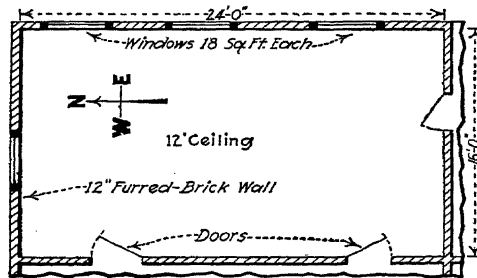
Computation of heat loss from a room. (First-story, residence living room; northeast exposure; 4 windows, 18 sq. ft. each; second-story room heated; basement unheated; ceiling and floor are wooden beams, planked over.)
